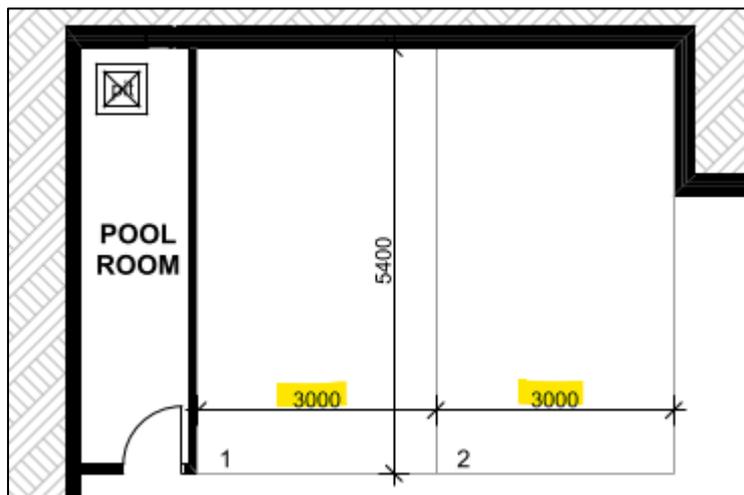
Extract of the approved basement floor plan in DA2020/1.
